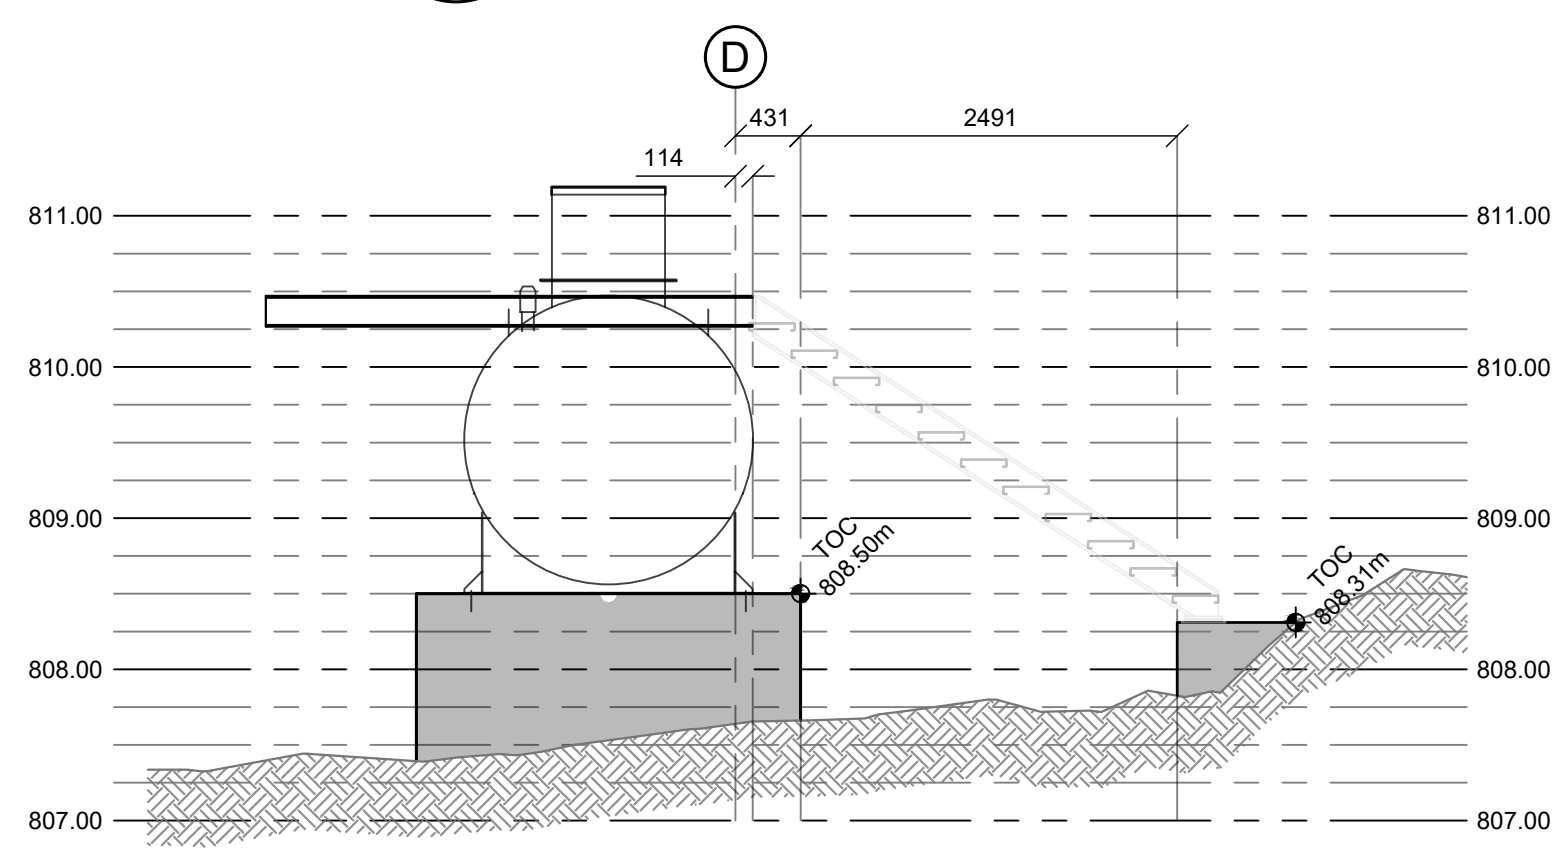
TEMPORARY BUILDING FOUNDATION LAYOUT
